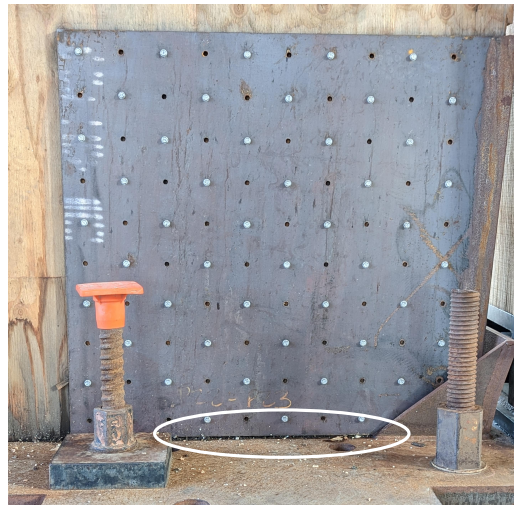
Gap between wall armor and foundation beam at the base of the post-tensioned rocking walls
